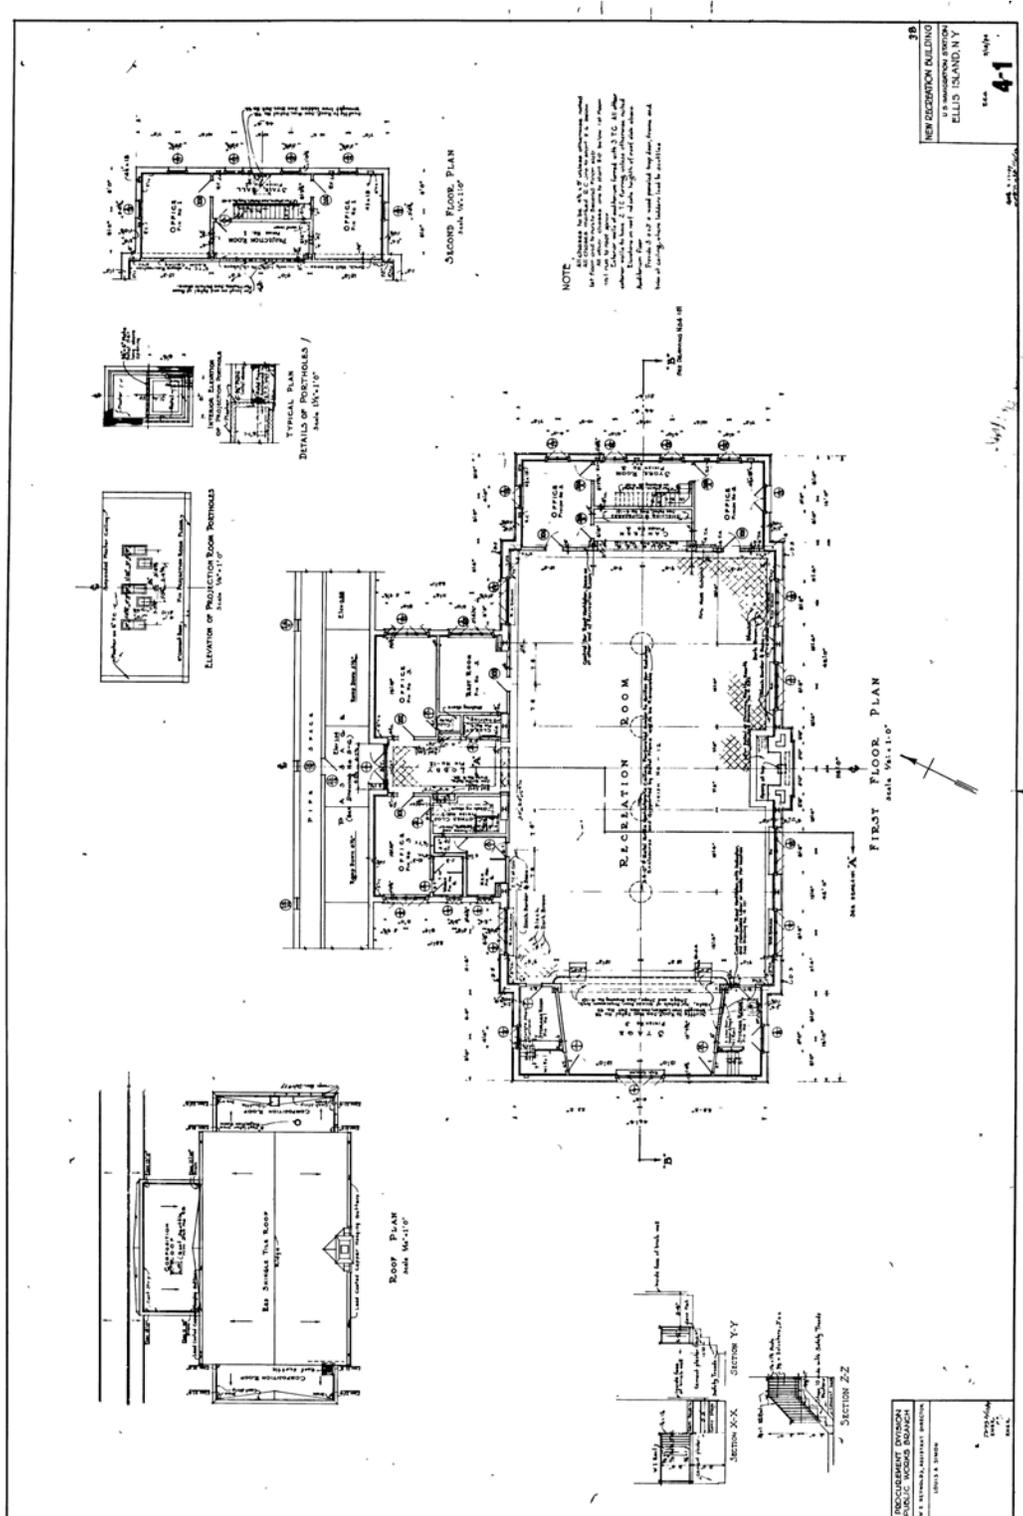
Floor Plans, New Recreation Building, Drawing No. 4-1, 15 February 1934.
